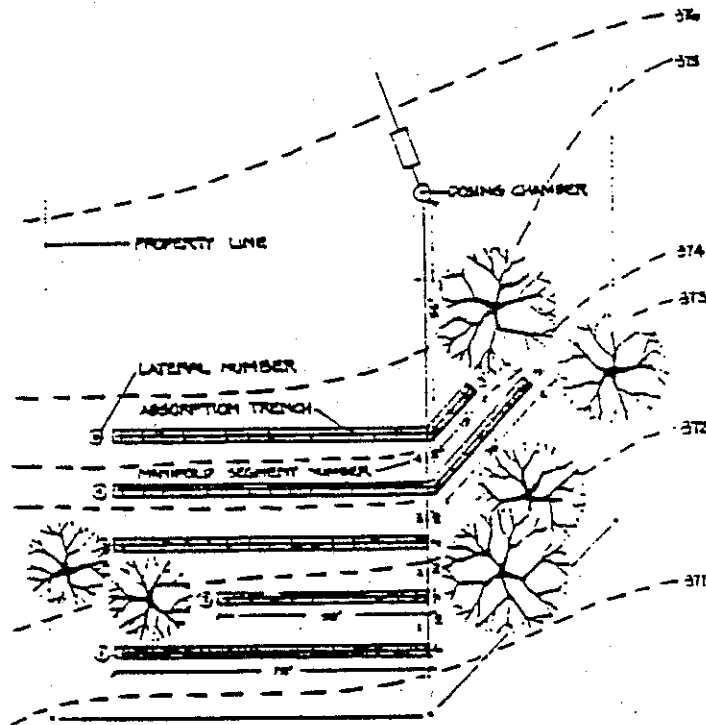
Network Layout for a Trench System on a Sloping Site (Example 3)
